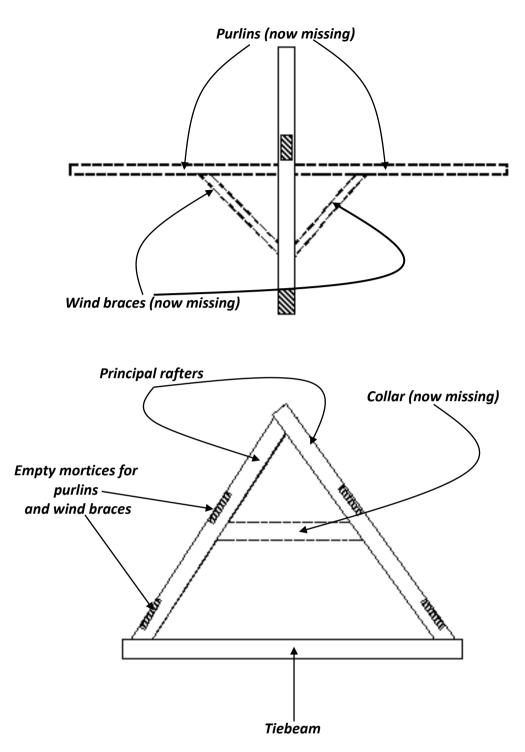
/b: Reconstructed possible long-section of the original roof (top), and cross-section through truss (bottom)
